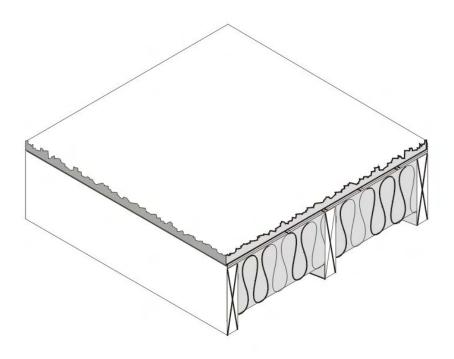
Wood Framed Floor without a Crawl Space
